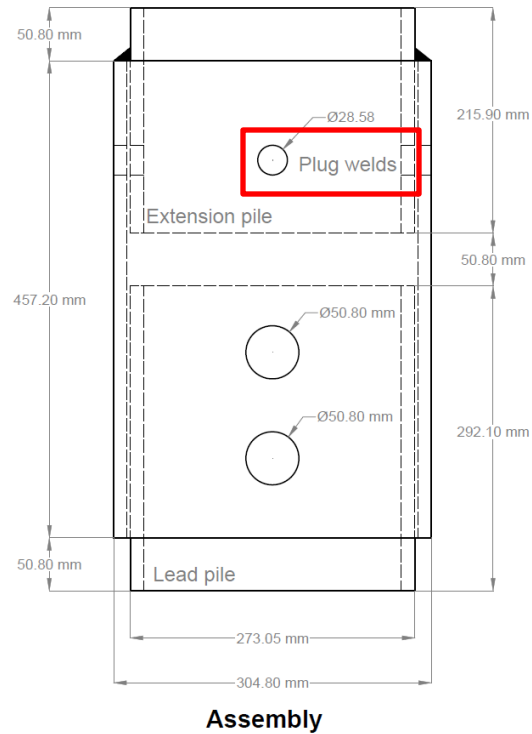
9. Location of the plug welds in the assembly.
